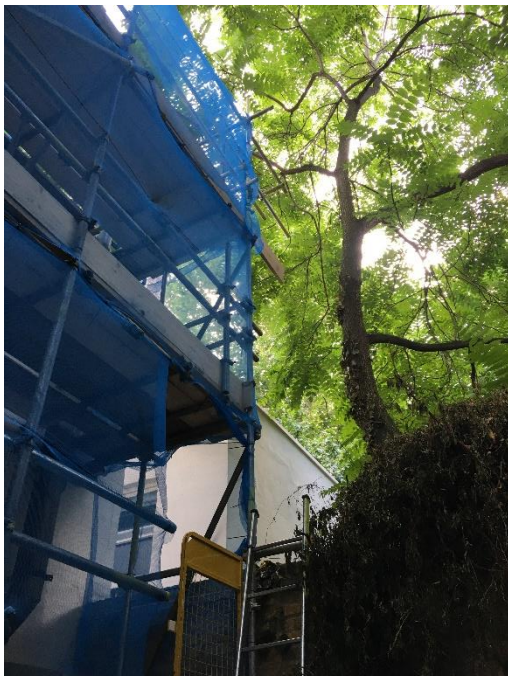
T7 Tree of heaven beyond the western boundary wall.
